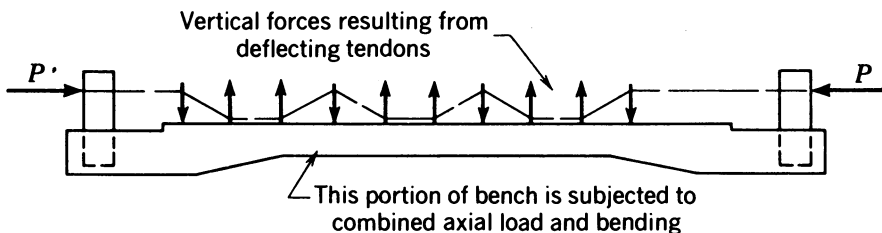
Elevation of a tendon-deflecting pretensioning bench.
